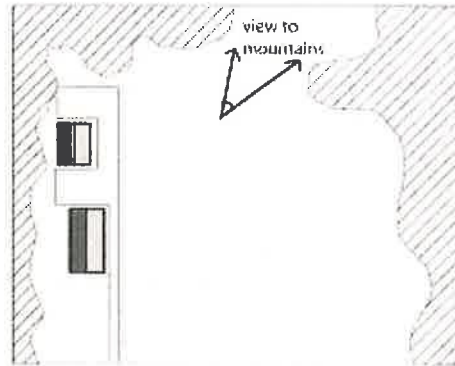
YES. Building placement conserves open space, shares driveway and maintains view.
